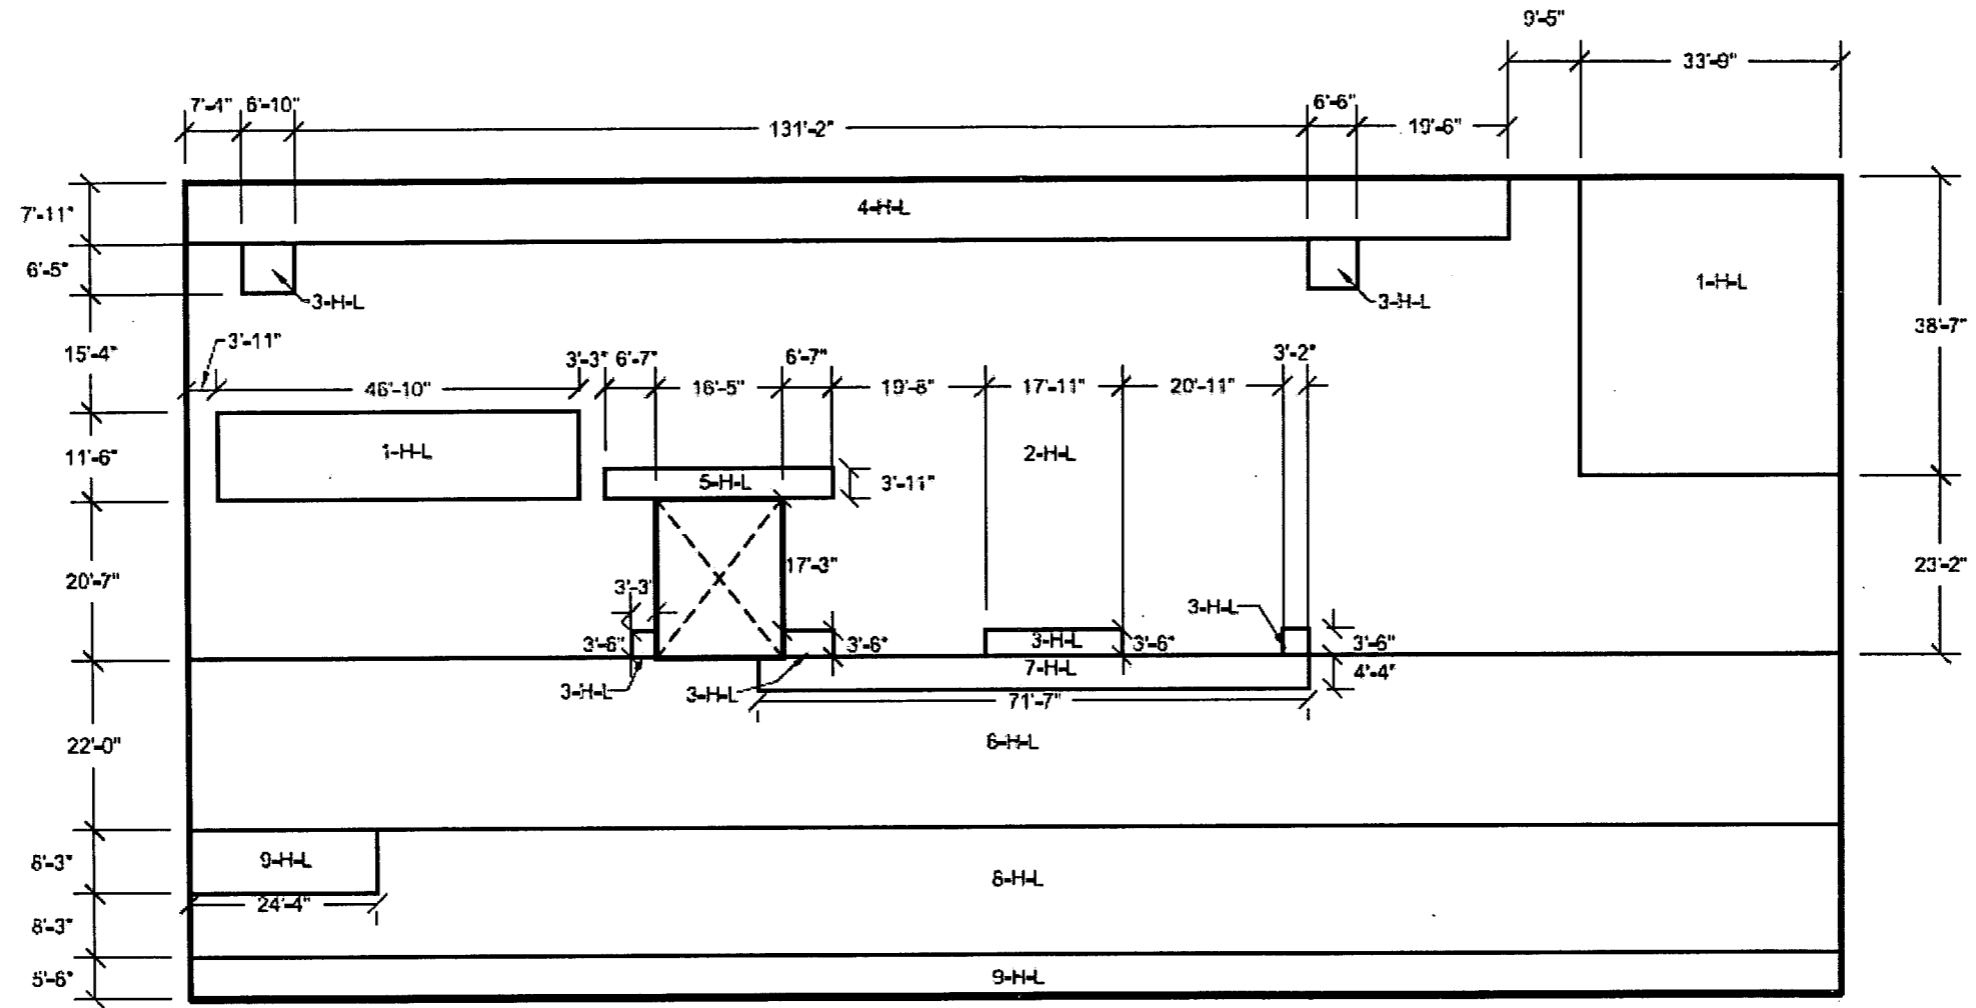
H.3-12: NORTH WALL LOOKING SOUTH
